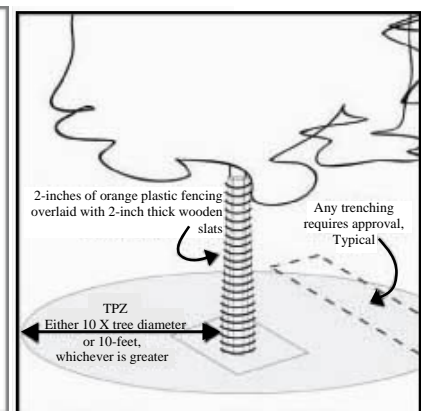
Type III Tree protection with trunk protected by a barrier to prevent mechanical damage. Image City of Palo Alto 2006.
